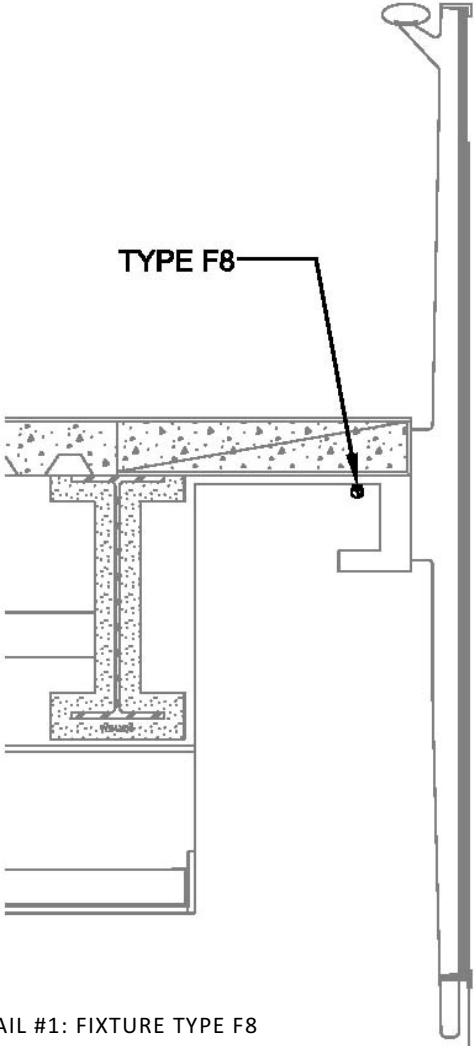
DETAIL #1: FIXTURE TYPE F8
